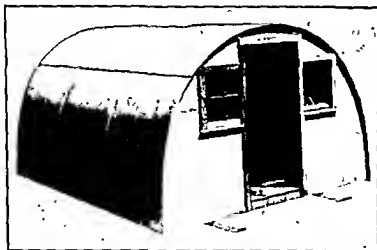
A brooder house built of sheet material made of asbestos and cement. (Johns-Manville.)
